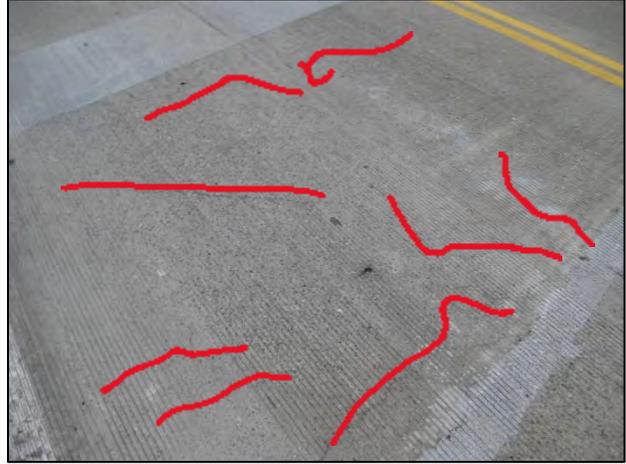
Multiple Random Cracking in Precast Panel
